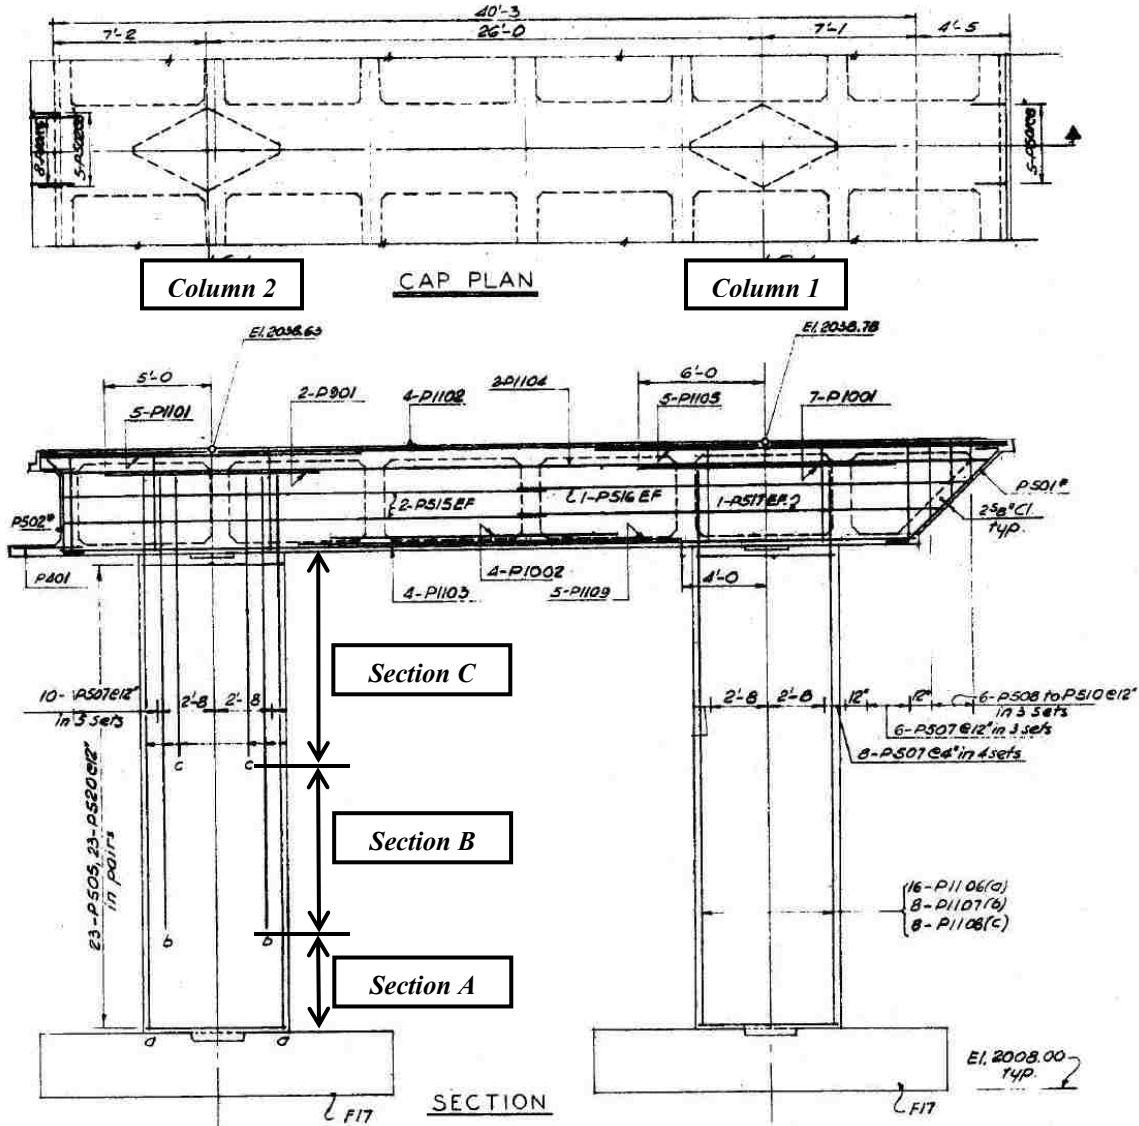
Bridge G-947 - Bent 1 and 2 typical elevation and cap beam plan
